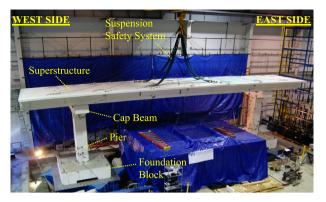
Precast concrete segmental bridge specimen in the Structural Engineering and Earthquake Simulation Laboratory at the University at Buffalo.
